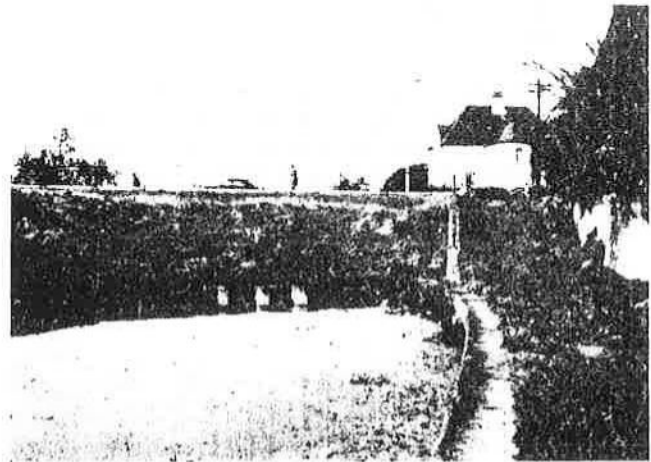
Culverted Bridge at Kirkintilloch on the Forth and Clyde Canal. (PFP)
